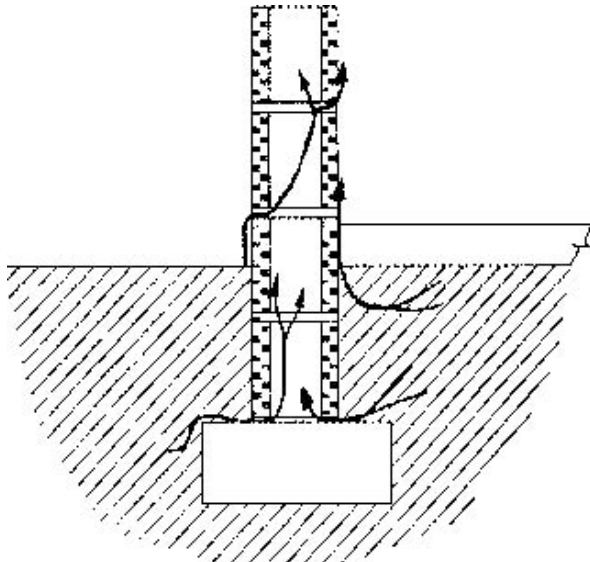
Floating slab block foundation, with arrows indicating possible termite entry points
